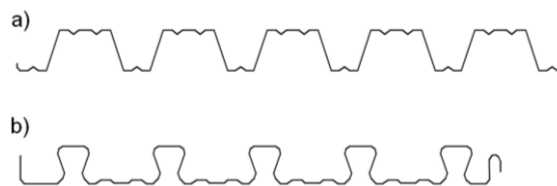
Types of steel sheets used for composite slabs: a) open trough profiled steel sheets, b) re-entrant profiled steel sheets
